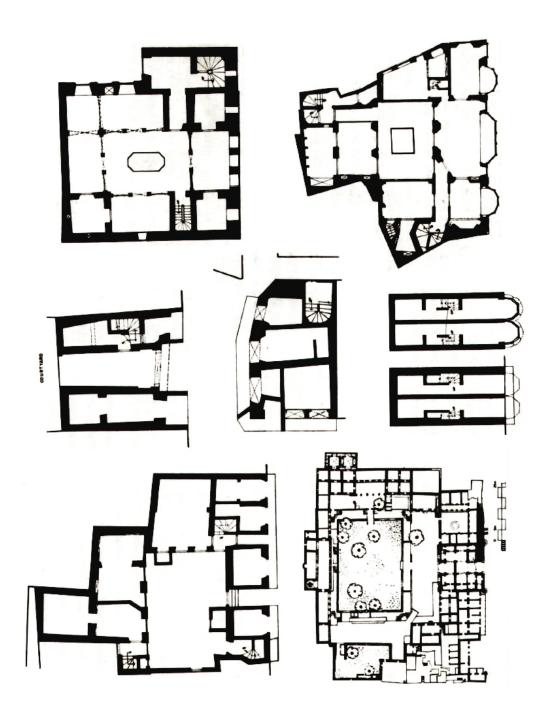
Traditional house layouts in the Walled City of Lahore, showing dwellings that belonged to various eras and were built for inhabitant for different economic profiles. The larger houses are Havelis that were occupied by High ranking officials whereas the narrow, elongated ones were homes to the lower income population. Despite the difference stakeholders, these houses were constructed in accordance with the local context, making most of the available resources. (Source: The Walled City of Lahore, publication by PEPAC)
